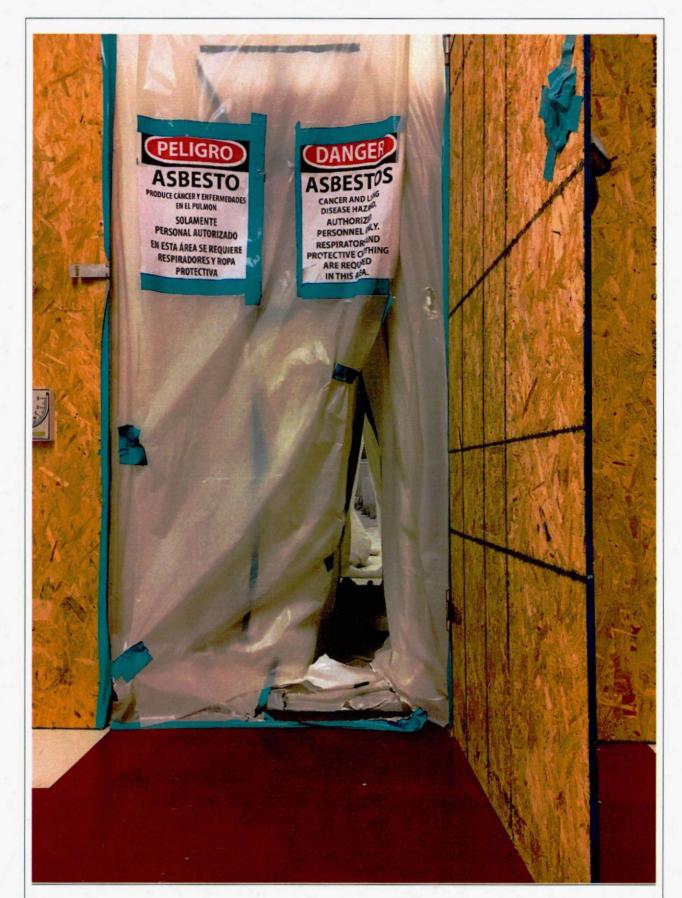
of 5 Description: Containment area one had an opening all the way through to the work area. Multiple children were observed sticking their heads in the hole to observe what was going on inside. The wooder door has the capability to be closed, but was open upon our arrival.
